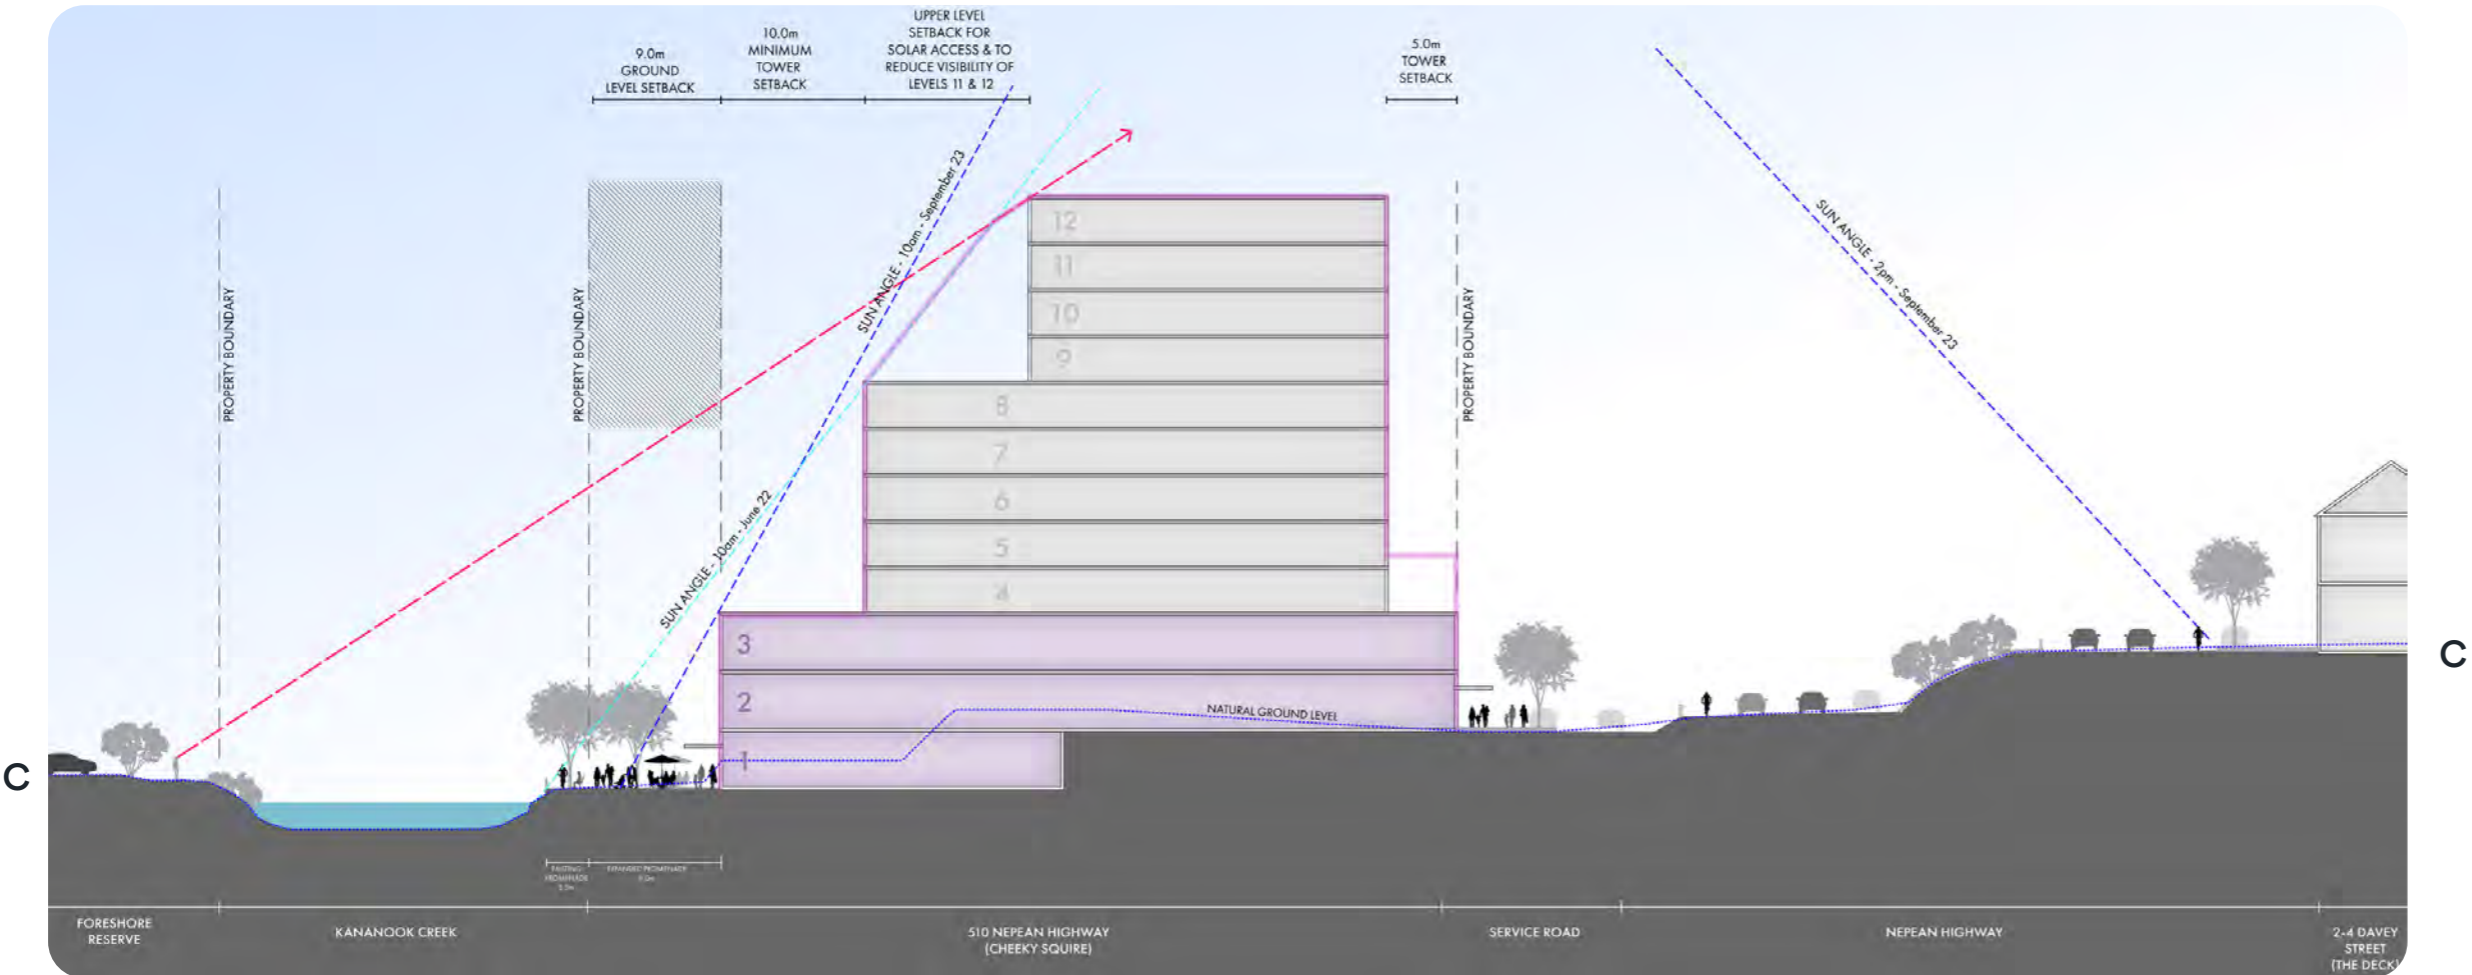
Built Form Recommendations Plan - Sub-Precinct C
